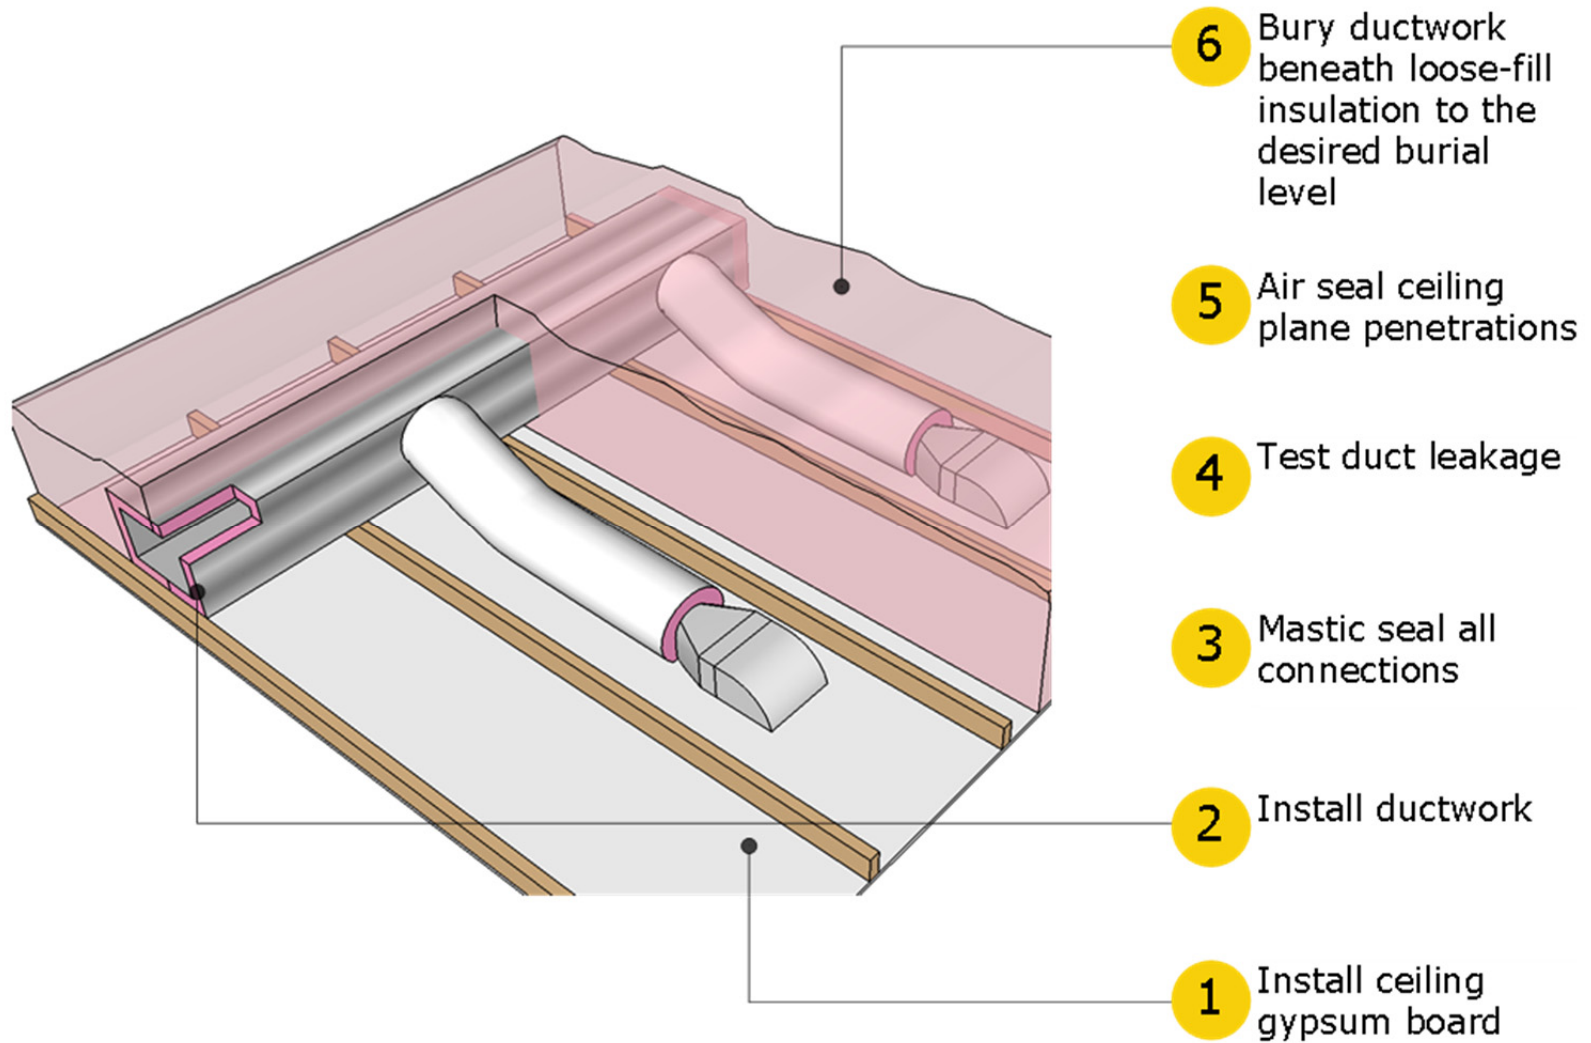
Step-by-step procedure diagram for buried ducts installed after ceiling in new construction
